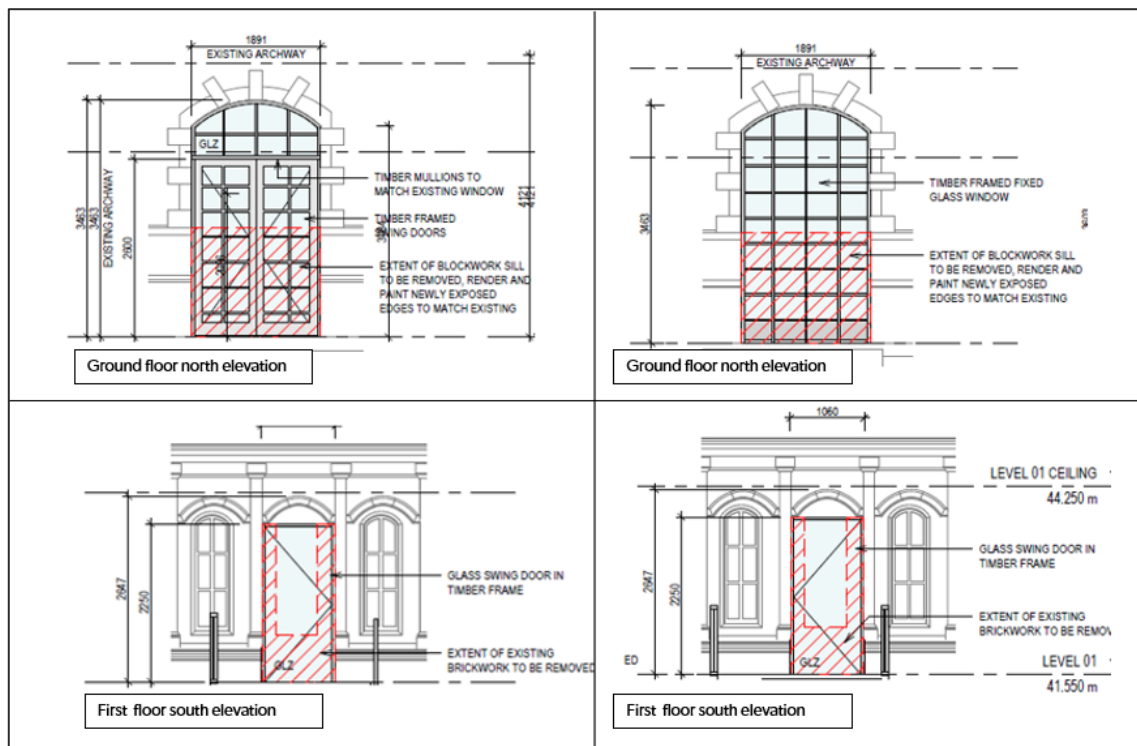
| Windows and door openings subject to removal of historic fabric (Source: Applicant's RtS)
